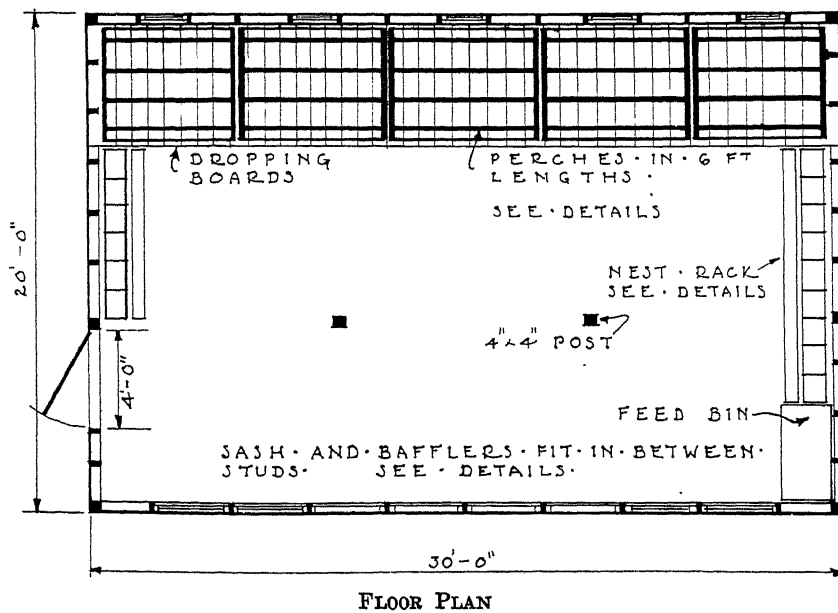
This cut shows the location of roosts, nests, feed bin, windows and door.
